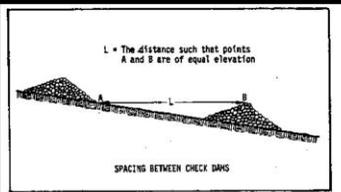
Spacing Between Check Dams Source: VA SWOC
